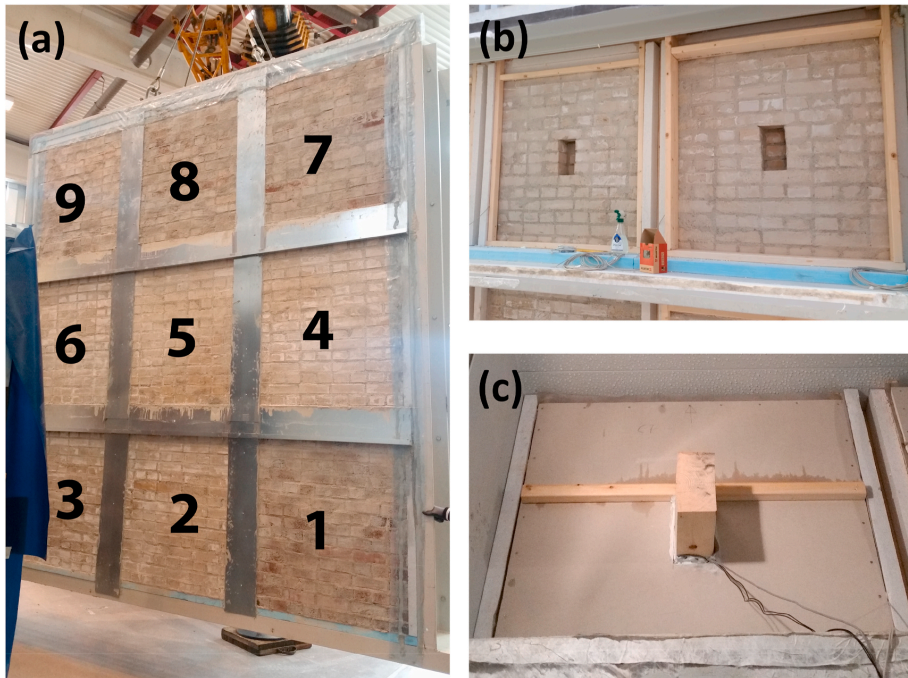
(a) Test wall. Exterior face with flashings/gutters mounted. Each segment numbered. (b) Interior view of seg. 5 and 6 before insulation was mounted. (c) Interior view of seg. 7 after completed. Transverse wooden board only to fix beam end.
